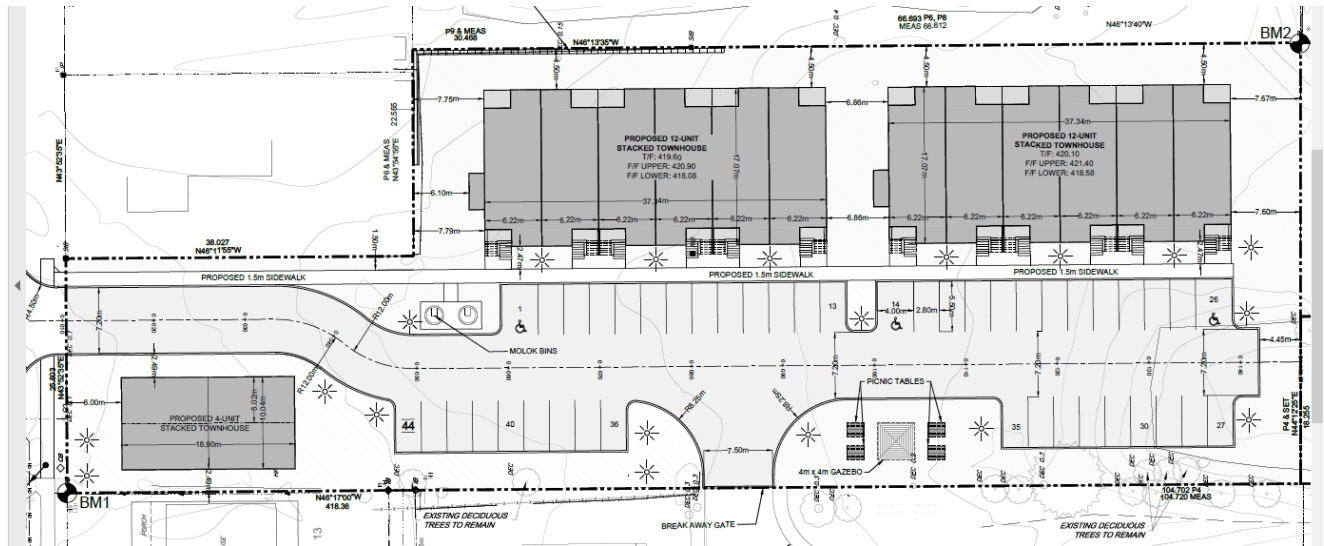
Site plan submitted by Cobide Engineering, December 2022
